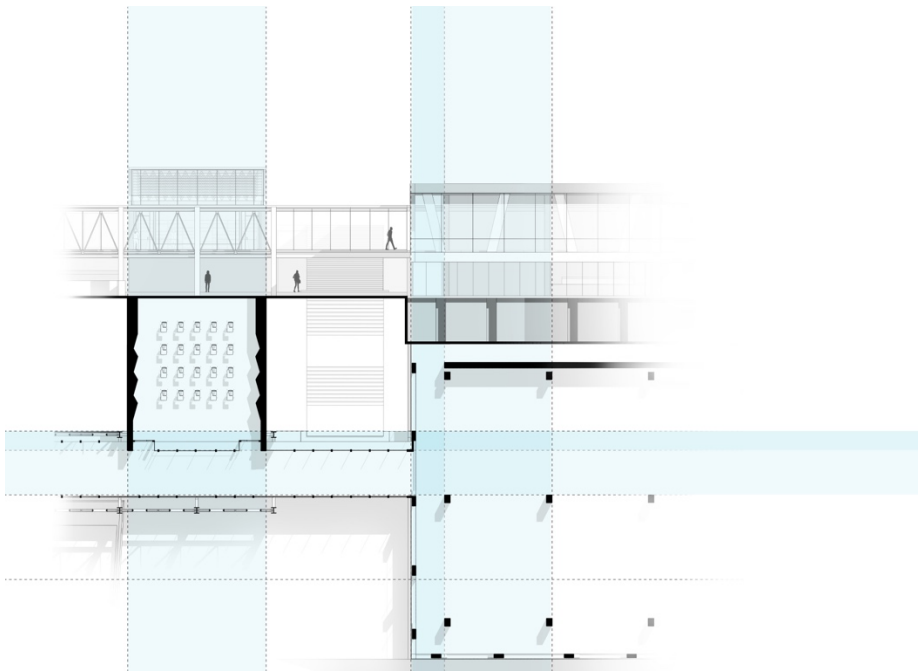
, Library Connection to Bridge and Science Labs (Source: Author)
